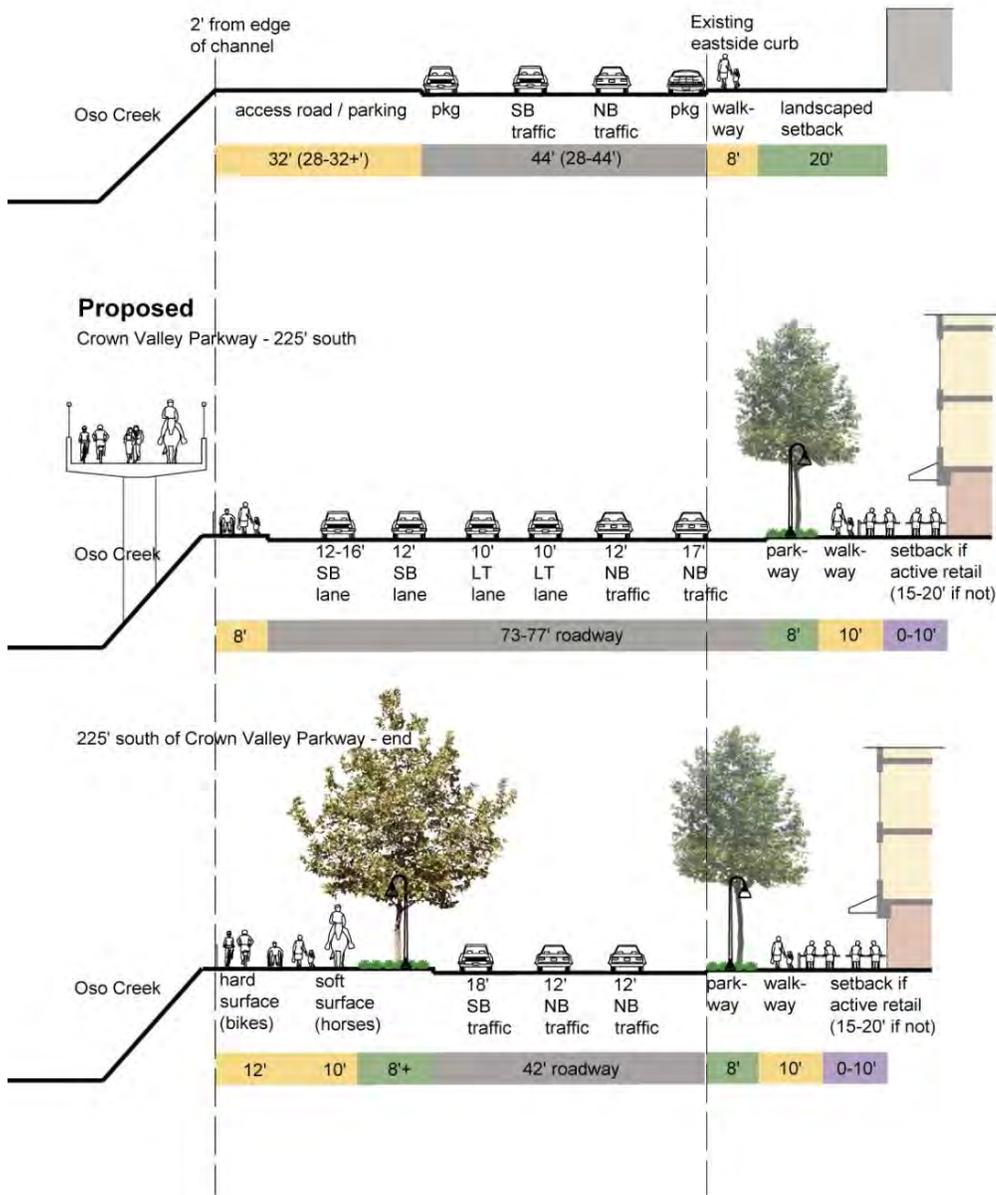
B Forbes Road, South of Crown Valley Parkway: Cross Sections—Looking North
